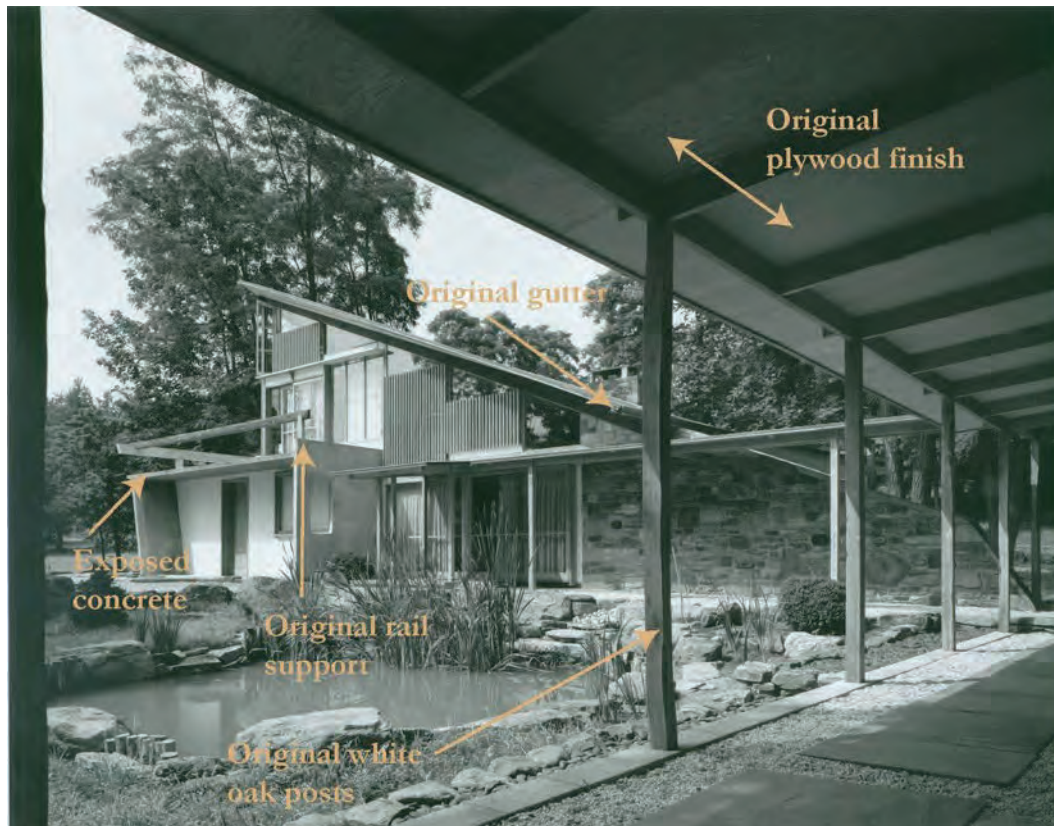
South elevation view. Date: 1965. Notice the original white oak posts, plywood soffit finish, rail support, and gutter. Source: George Nakashima Woodworker SA, Ltd. Archives.
